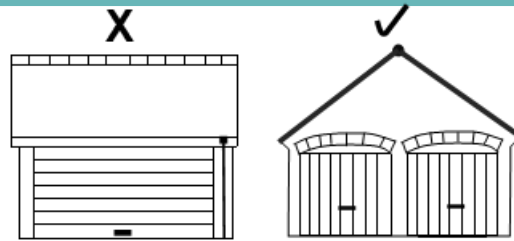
Double garages should be accessed by two separate doors divided by a pier if in a conservation area or within the setting/surroundings of a listed building.
